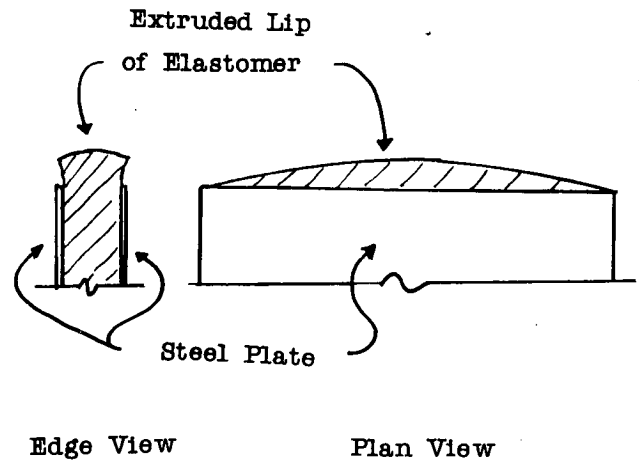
Protruding lip of elastomer caused by the fatigue cracks in the bearing.
